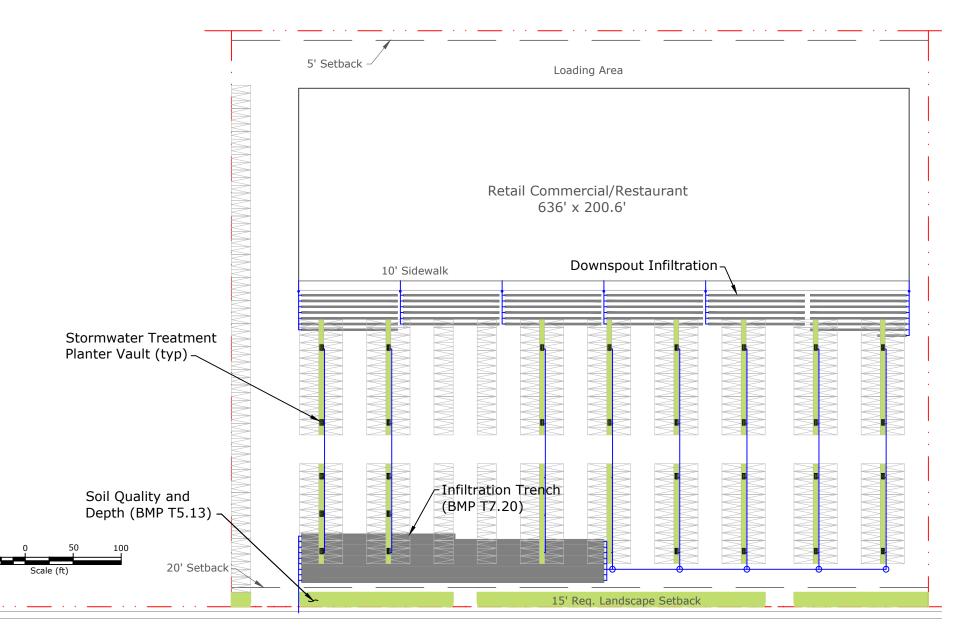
Scenario 11. Permanent Stormwater Site Plan – Large Commercial Development, 2005 Requirements, Outwash Soils
